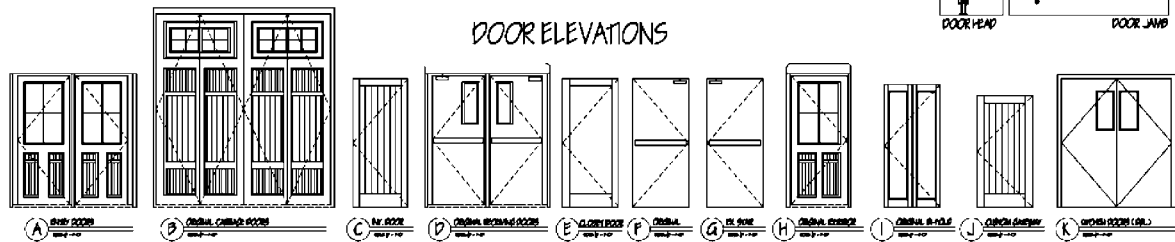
Door schedules spell out the specific details of every door and are keyed to the floor plan.
